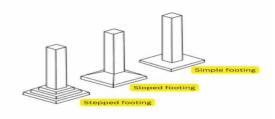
Footing shape (Jonathan Strahan, 2011)
